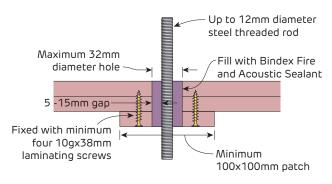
Up to 12mm steel diameter threaded rod Maintains RISF and FRL of ceiling under floor/roof systems Patch below ceiling lining Valid for 2 layers only - Section
